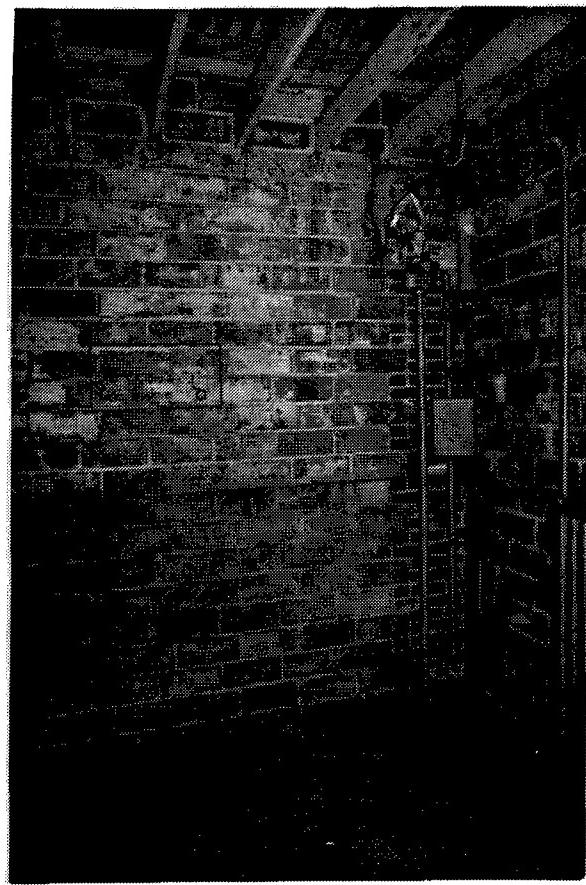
Building 2B-22: Interior view of this Solvent Storage Building.
